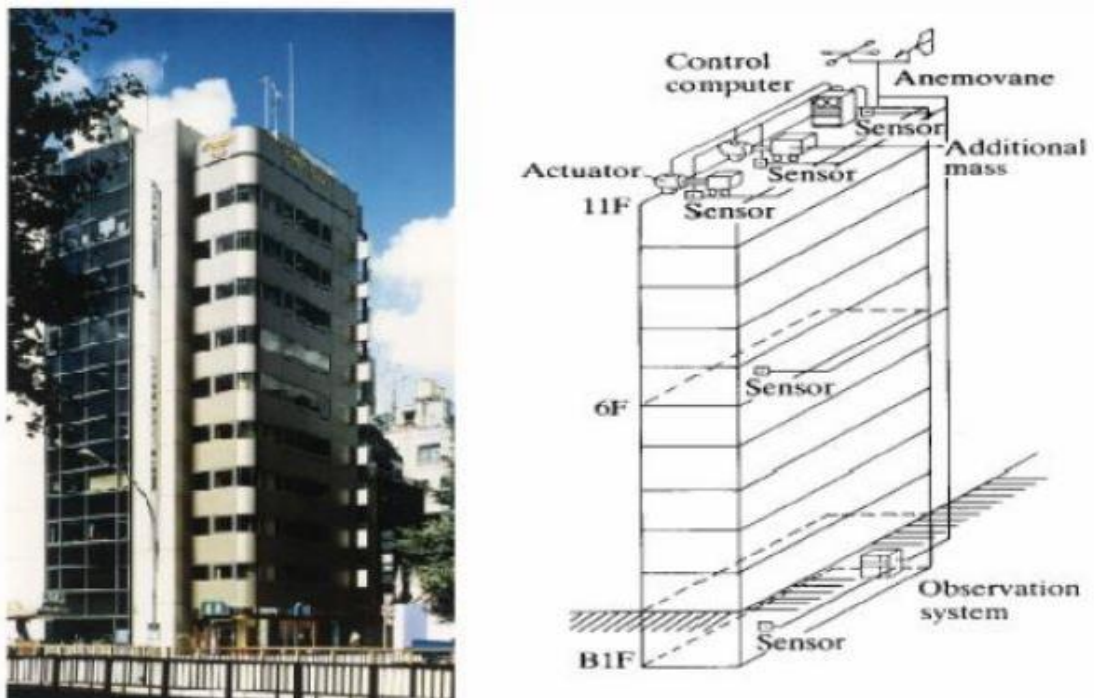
Kyobashi Seiwa Building, Tokyo, Japan
